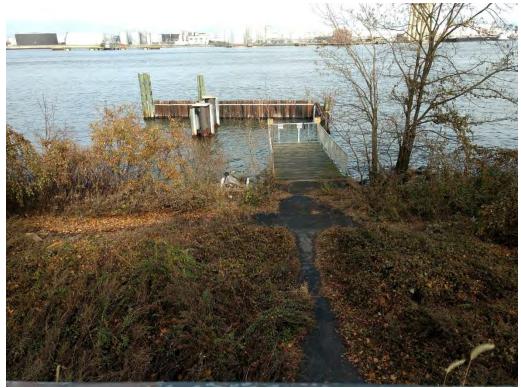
Section 2, proposed staging area on the south side of Richmond Terrace near Franklin Avenue. View looking south.
